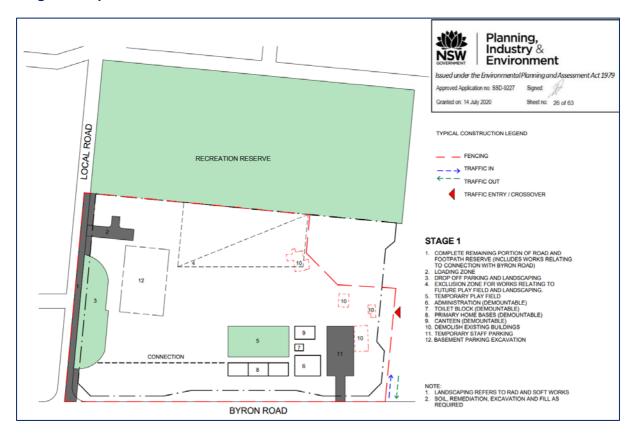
| Stage 1 site plan – as approved (Source: SSD-9227 Approved Plans)
